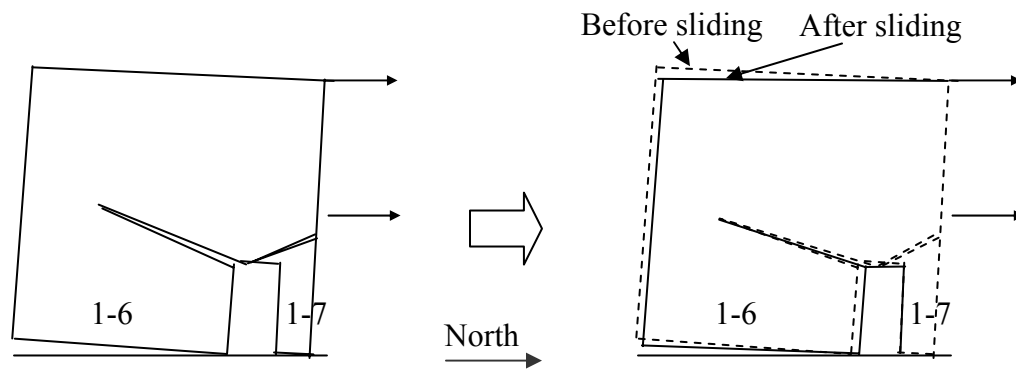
Switching failure modes of Pier 1-6 from rocking to sliding when the wall was loaded in the pull direction (northward) in Cycle 10
